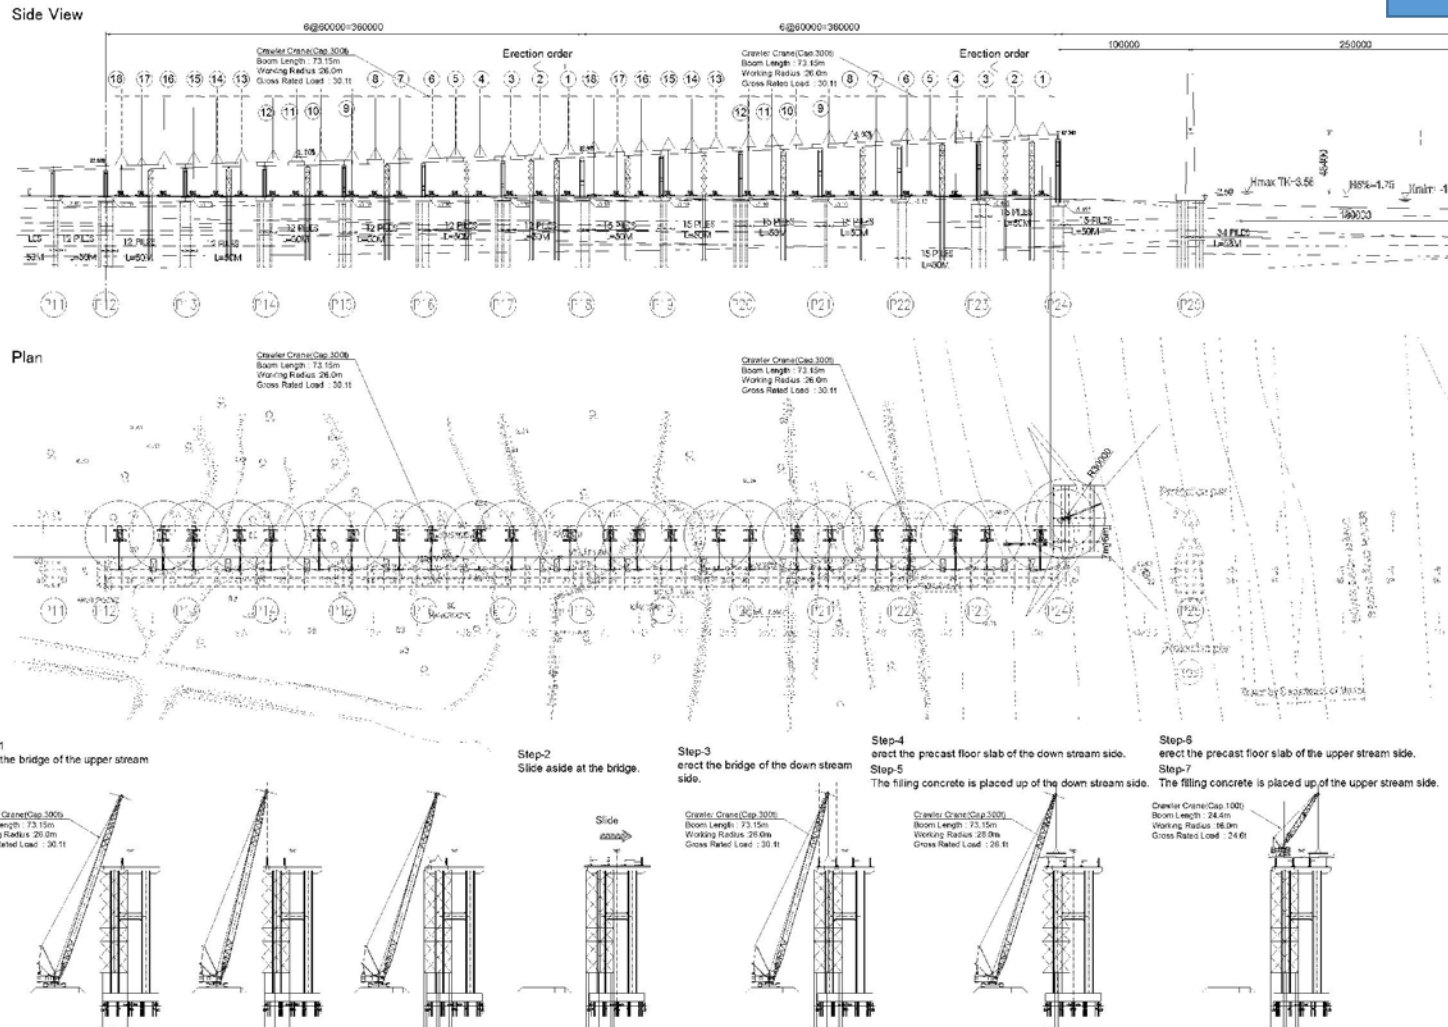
Approach Bridge (Steel Girder)/Assembly Procedure Drawing (1)
